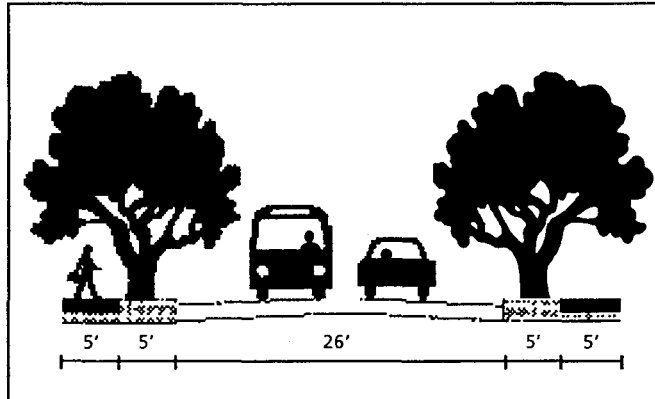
demonstrates a site plan map that a developer would provide to meet code regulations for the subdivision of a single parcel. Figure 6.2 shows a street cross-section that could be submitted by a developer for approval during the permitting process.
